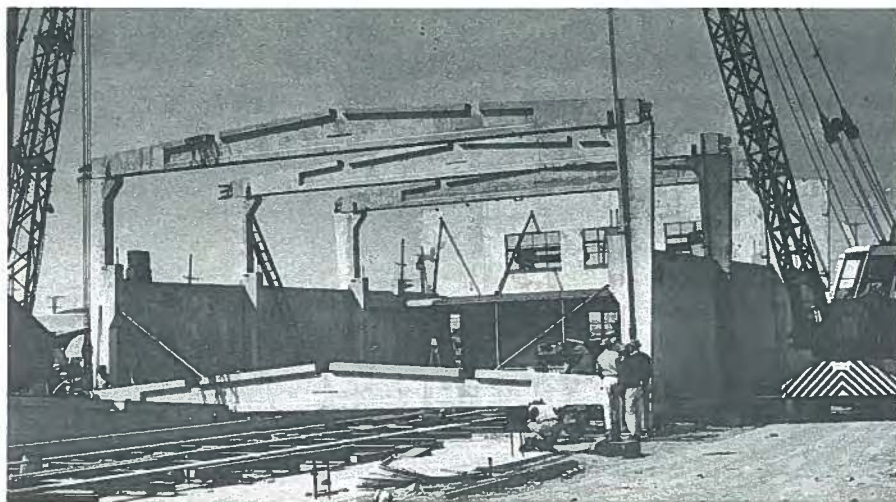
Erection of prestressed roof girders of Concrete Engineering Co. plant.
